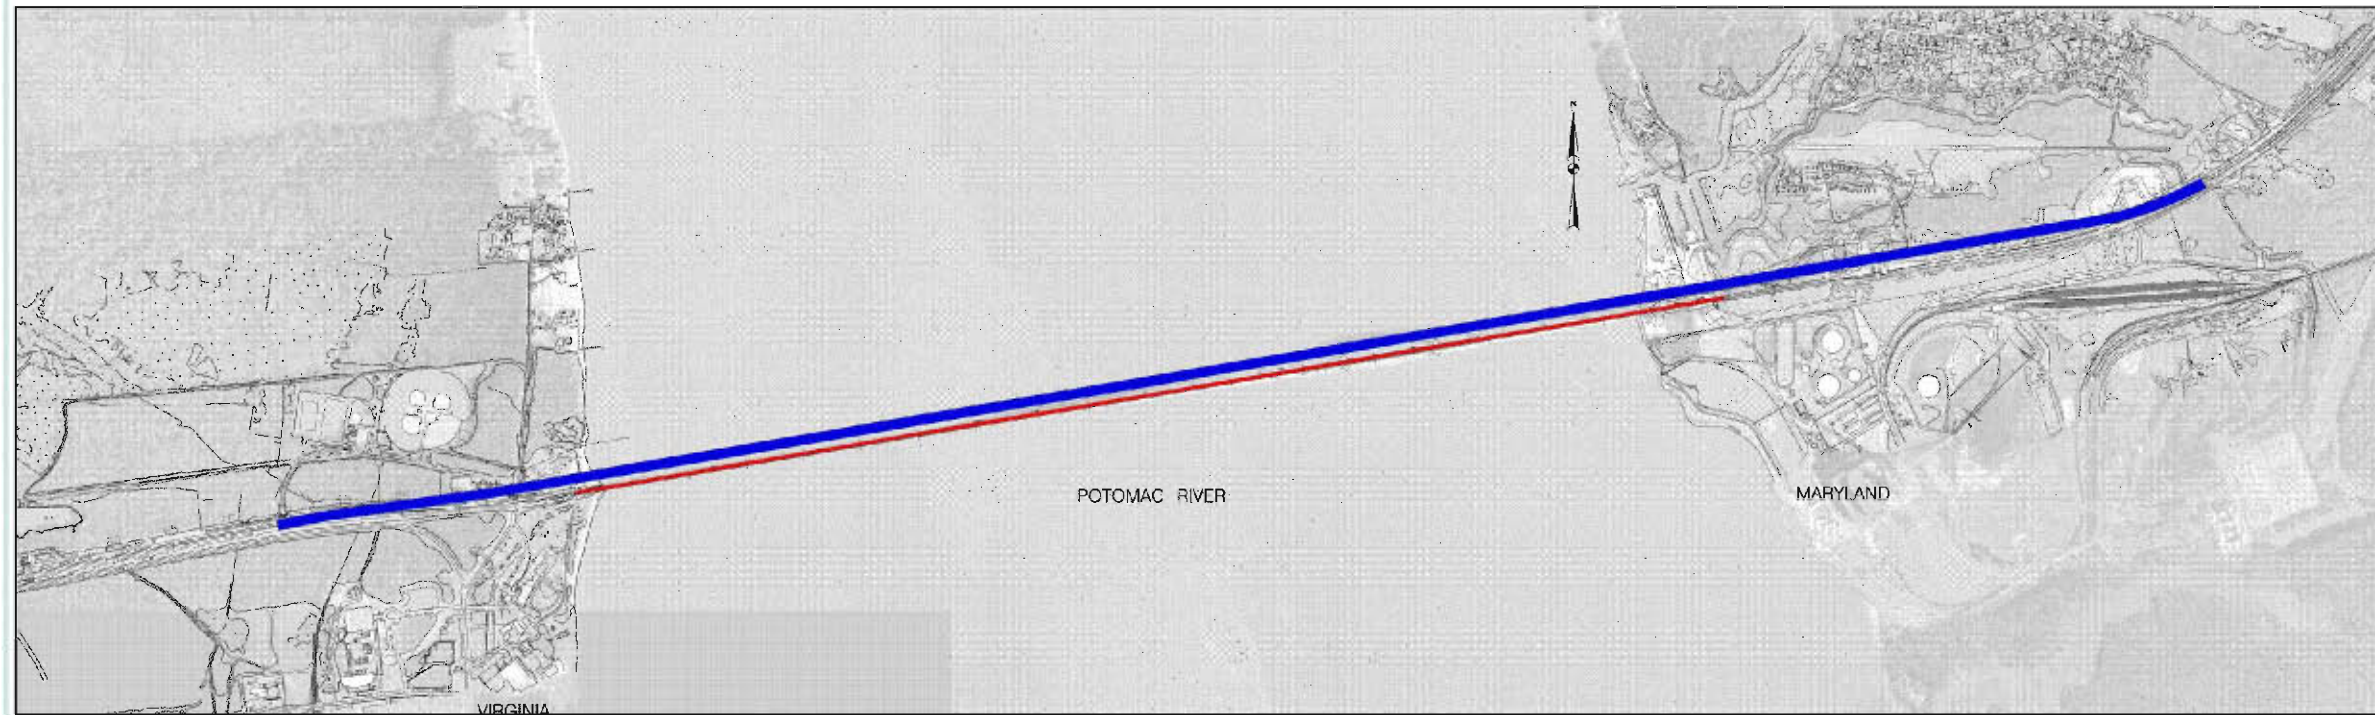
Alternate 6 – New Four-Lane Bridge to the South, Take Existing Bridge Out of Service.
